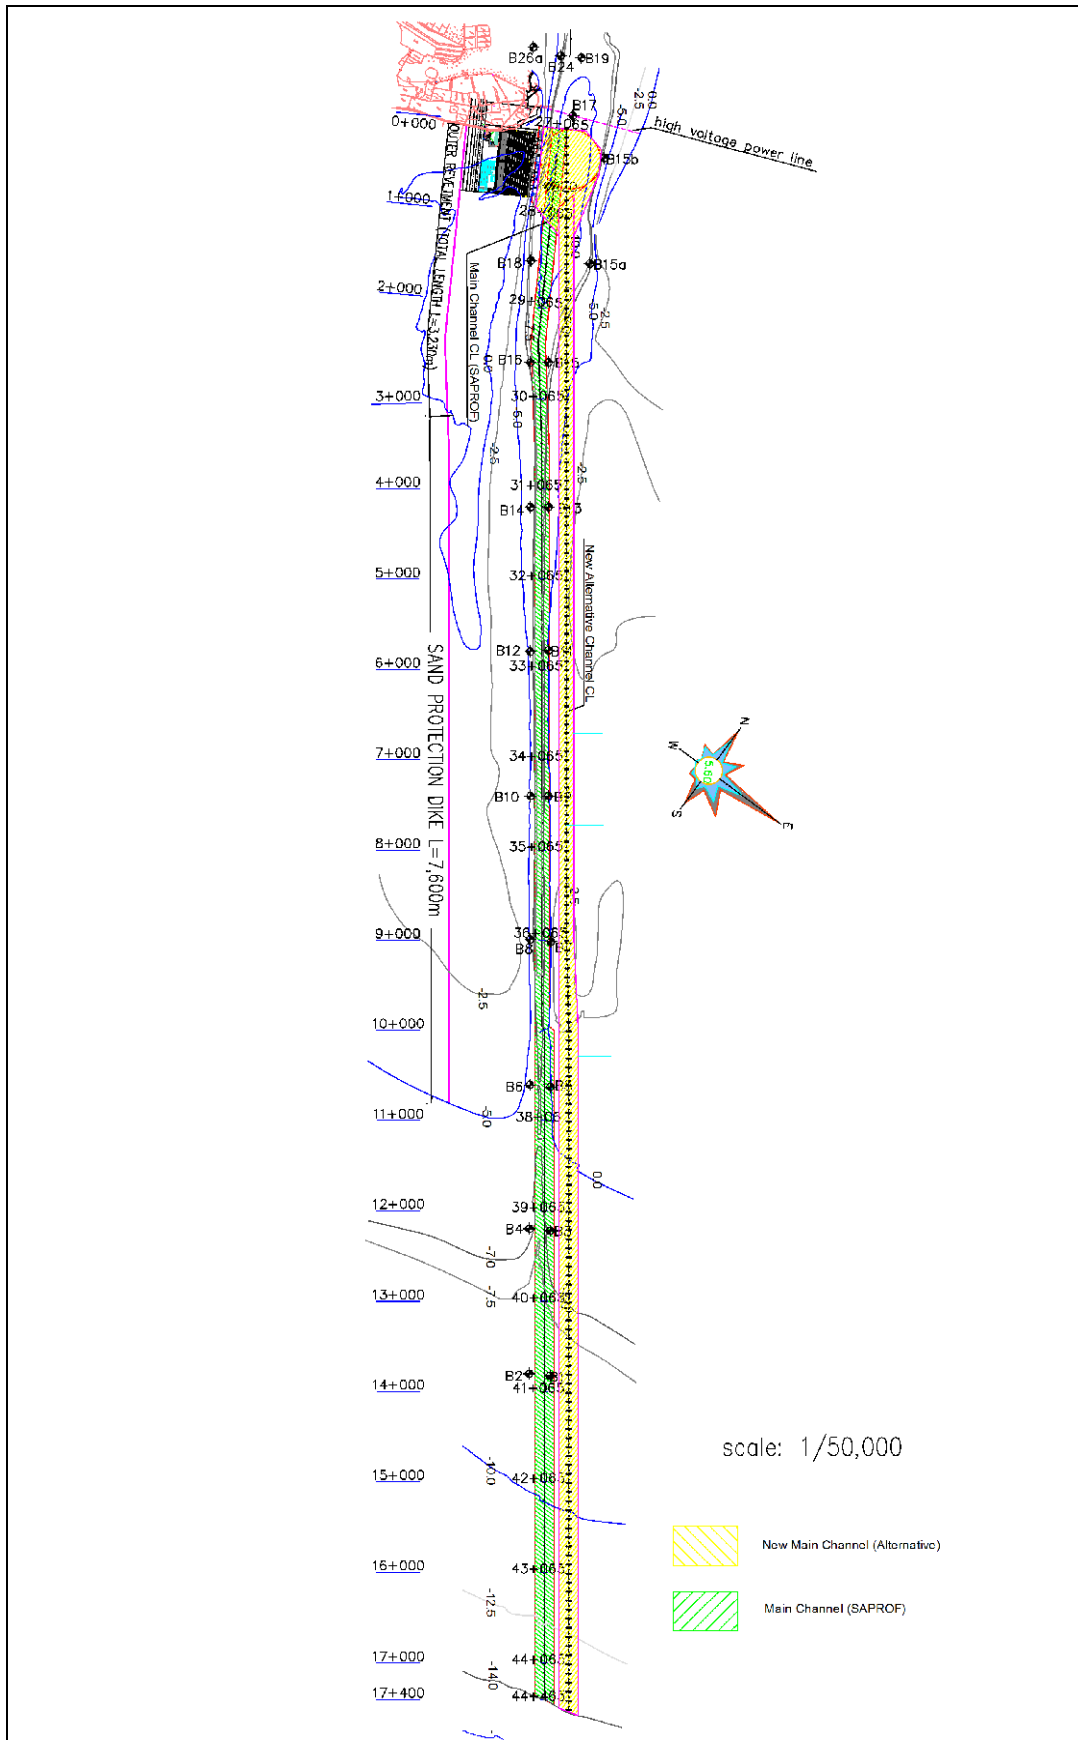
Alternative Case 17 General layout plan of the Channel shifted 270m east side
